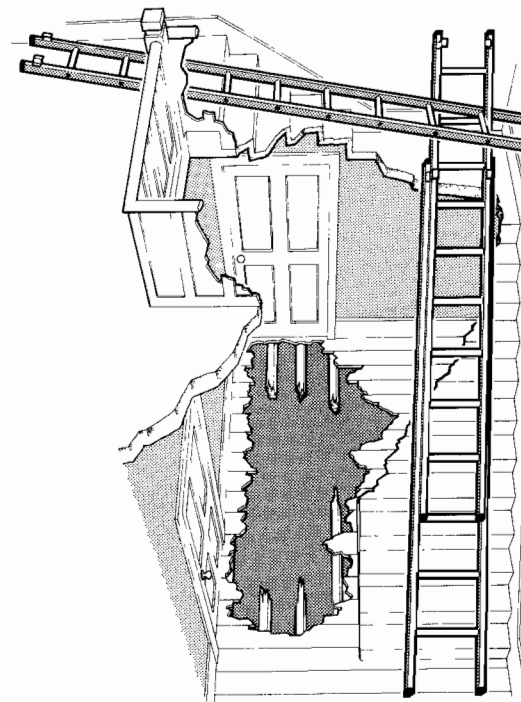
One method of replacing a damaged staircase by means of short extension ladders.
